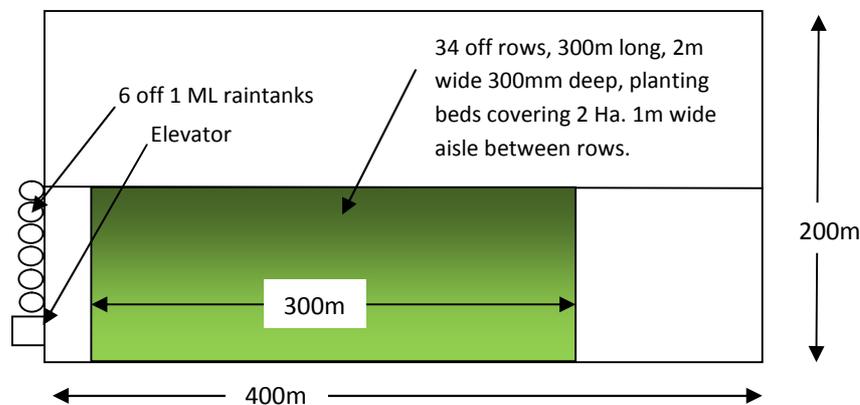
Sketch showing a plan view of the 8 Ha distribution centre (not to scale)
